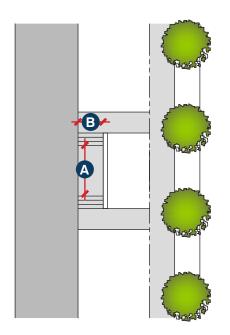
FIGURE: STOOP FRONTAGE PLAN VIEW DIAGRAM
